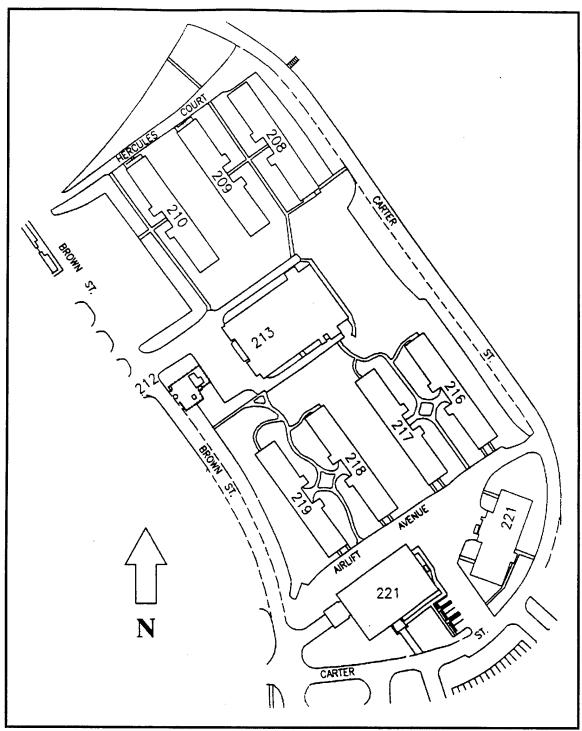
911th TAG Dining Hall/Boiler Plant layout with adjacent buildings.
